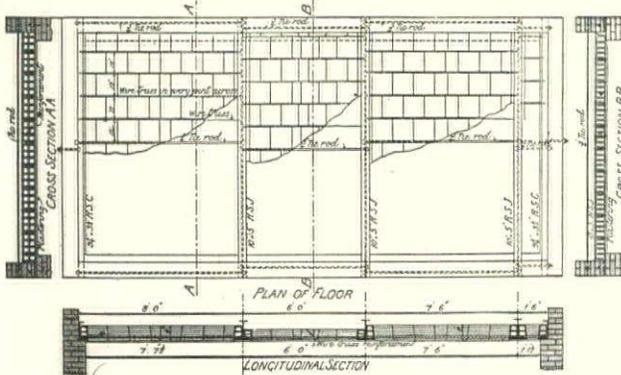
PLAN AND SECTION OF BEVIER FLOOR TESTED BY BRITISH FIRE PREVENTION COMMITTEE FOR "FULL PROTECTION."
